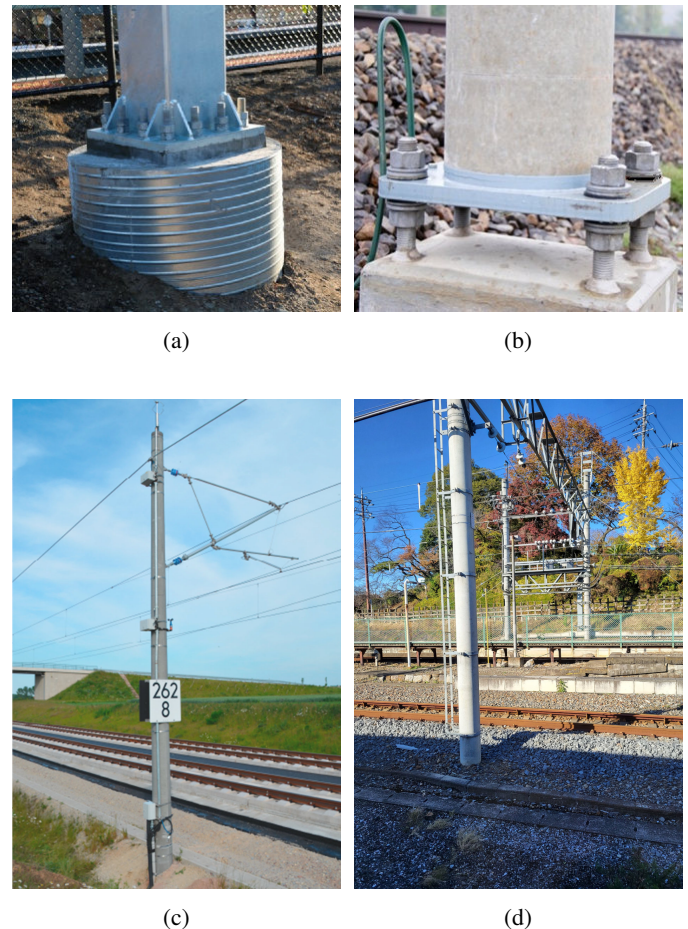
Common column-base connection examples: (a) On a monolithic foundation with a grout under the base plate – example from Australia (picture [7]), (b) on a prefabricated foundation with a so-called distance connection – example from Poland, (c), (d) column embedded in the ground – examples from Germany (picture [1]) and Japan
